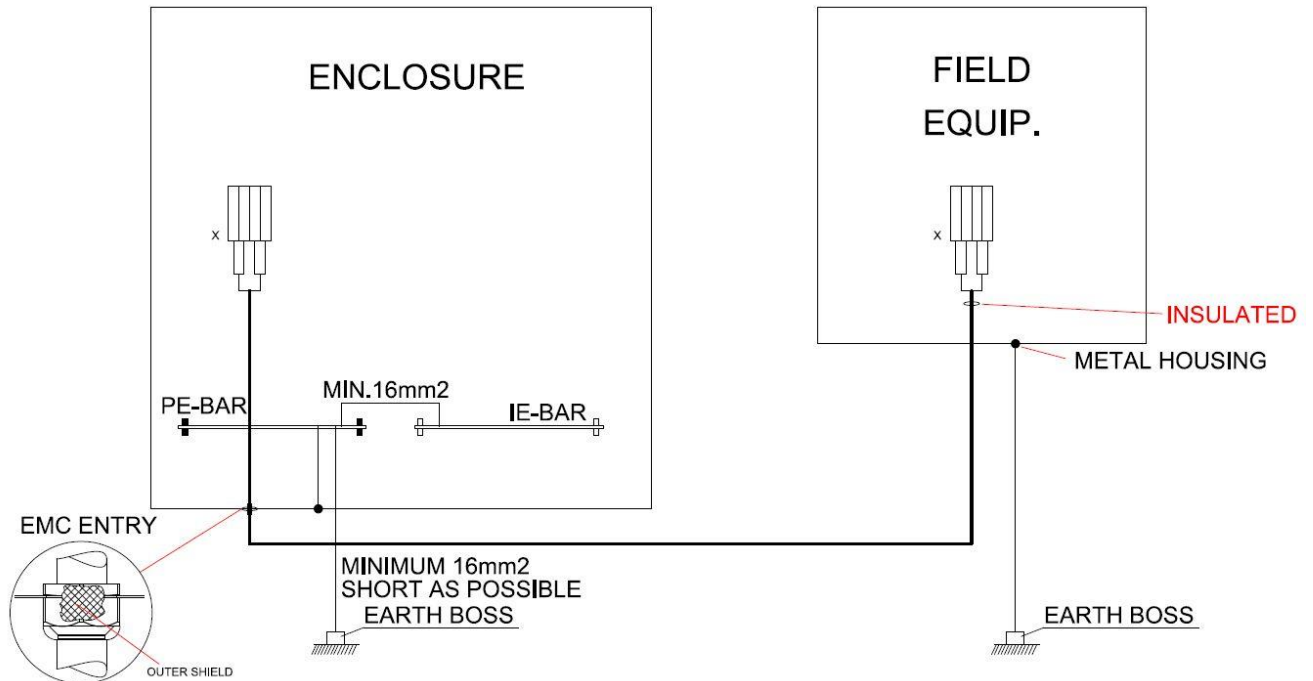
Instrument cable with overall shield/braiding connection EMC entry
